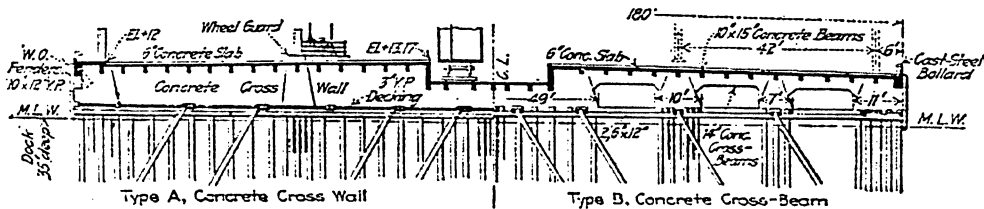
Piers 38 & 40 with Reinforced Concrete Decks, Cross Walls and Posts on Wooden Piles, Philadelphia, Pa.
